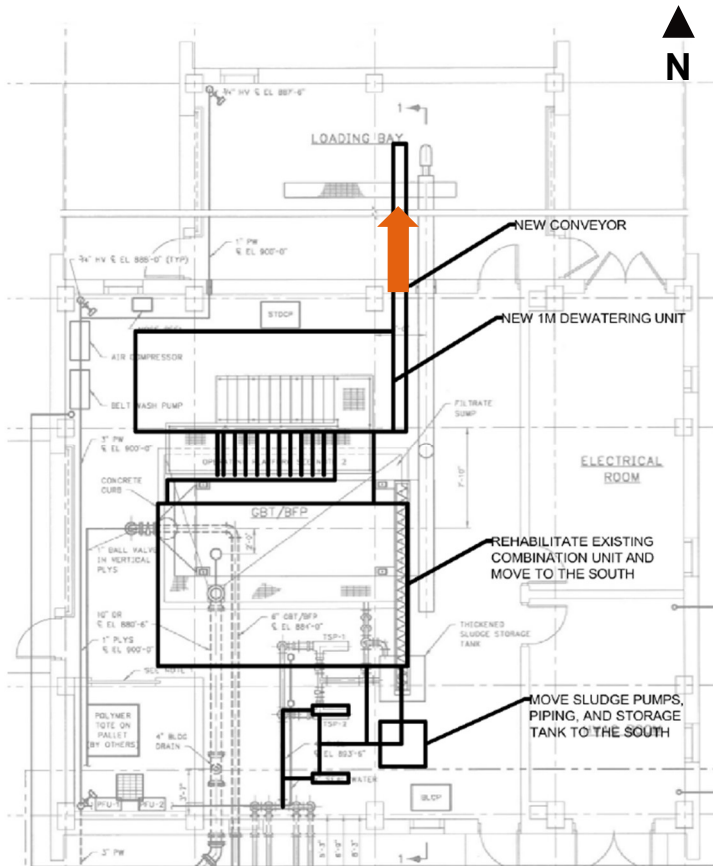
Layout of 1-Meter Dewatering Unit and Existing Unit
